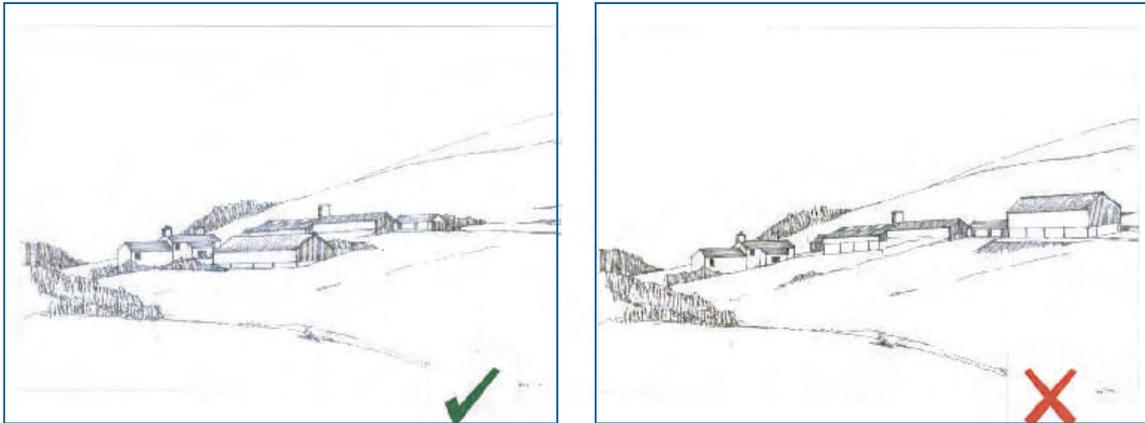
Set new buildings back so that they do not obscure existing buildings
